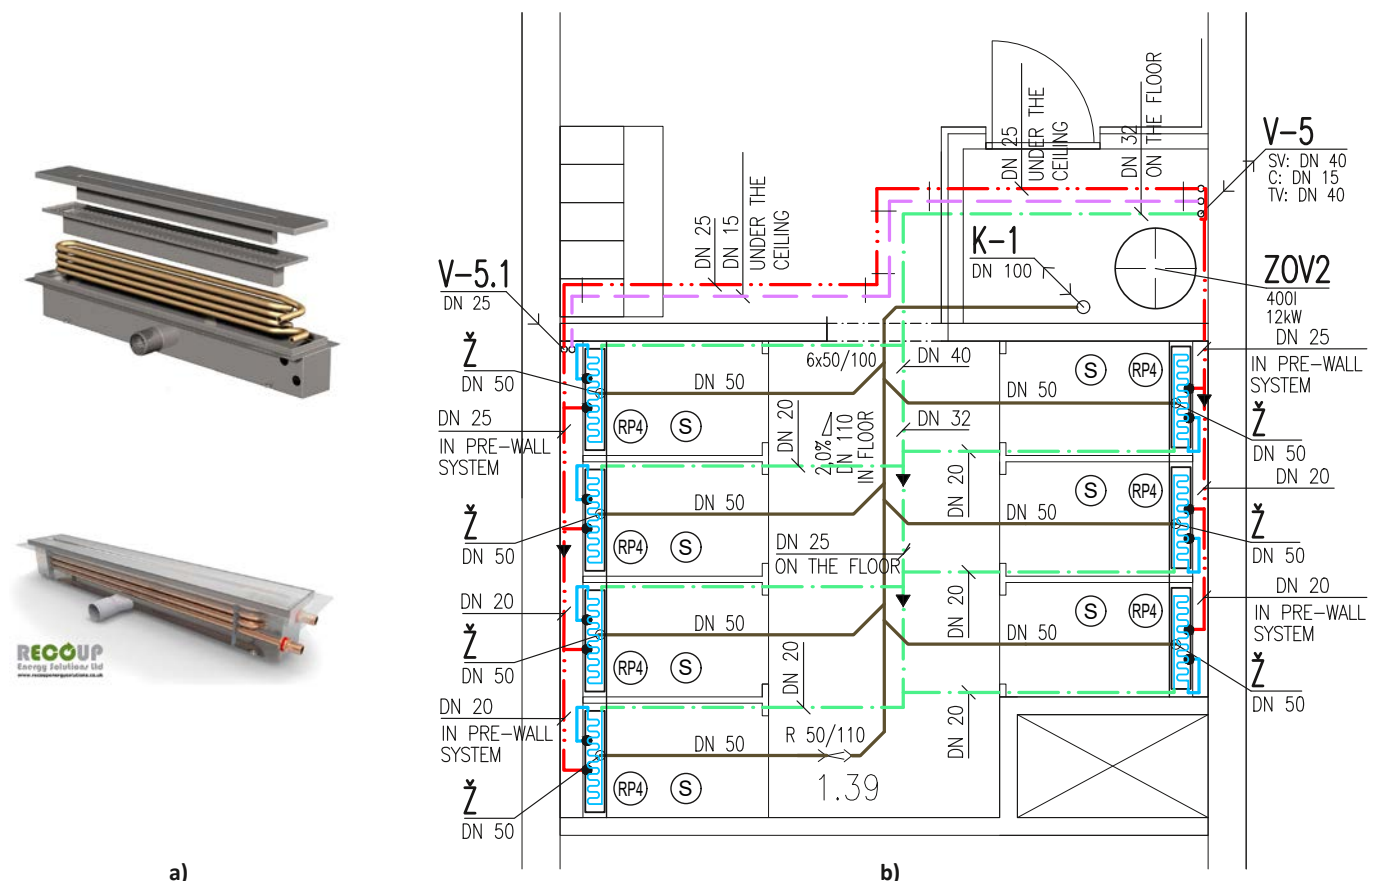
Recovery of waste heat using a heat exchanger in combination with a shower with floor drain system. a) view to the heat exchanger [4], b) floor plan with an application of this heat exchanger. V = rising pipe of cold water, hot water and circulation of hot water, K = foul water stack, ZOV = water heater, Ž = shower with a floor drain system, RP4 = heat exchanger in a combination with floor drain system, S = thermostatic shower mixture tap. [author]
